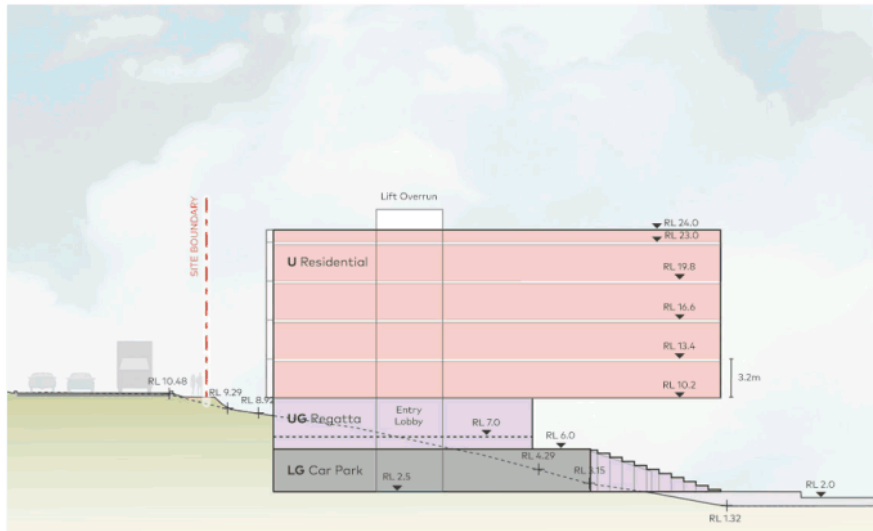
Option 1 - Residential with Regatta Stand - Section through Building 1
